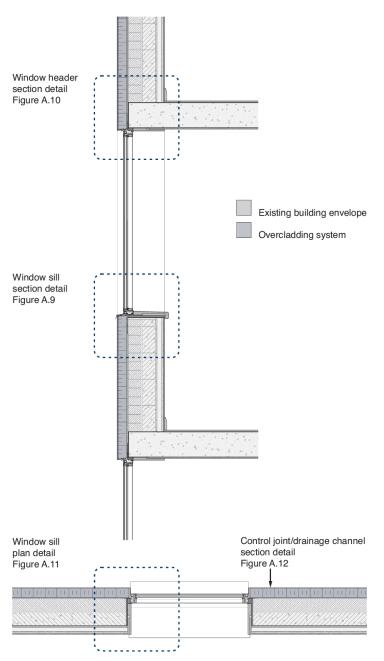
Section and plan views of a typical wall and window assembly with corresponding detail drawings denoted.
